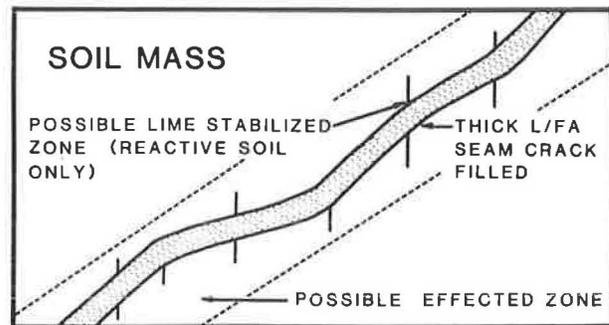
Large crack after stabilization with lime/fly ash injection.
